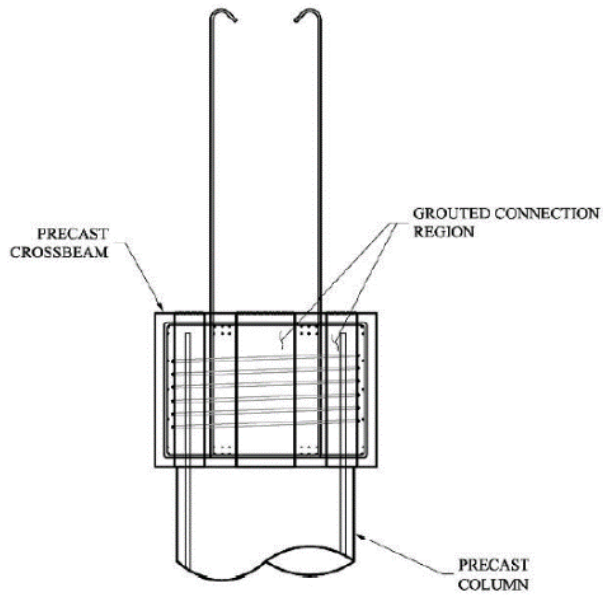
Column and cap beam slotted opening connection proposed by Hieber et al. (2005)
